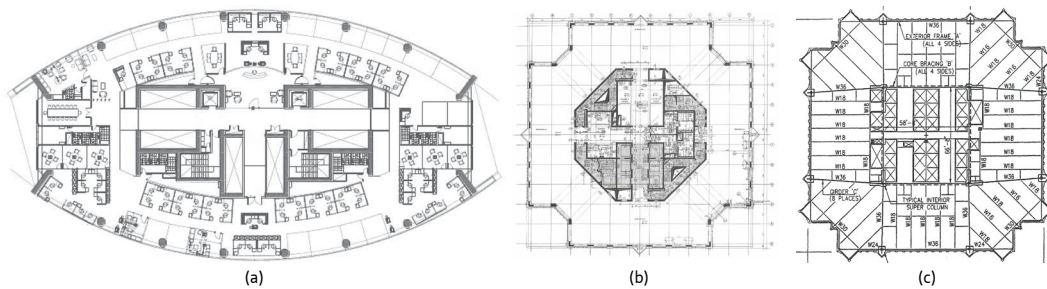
Floor plans of Titanium (a), Messeturm (b), and Nations Bank Plaza (c) buildings.
